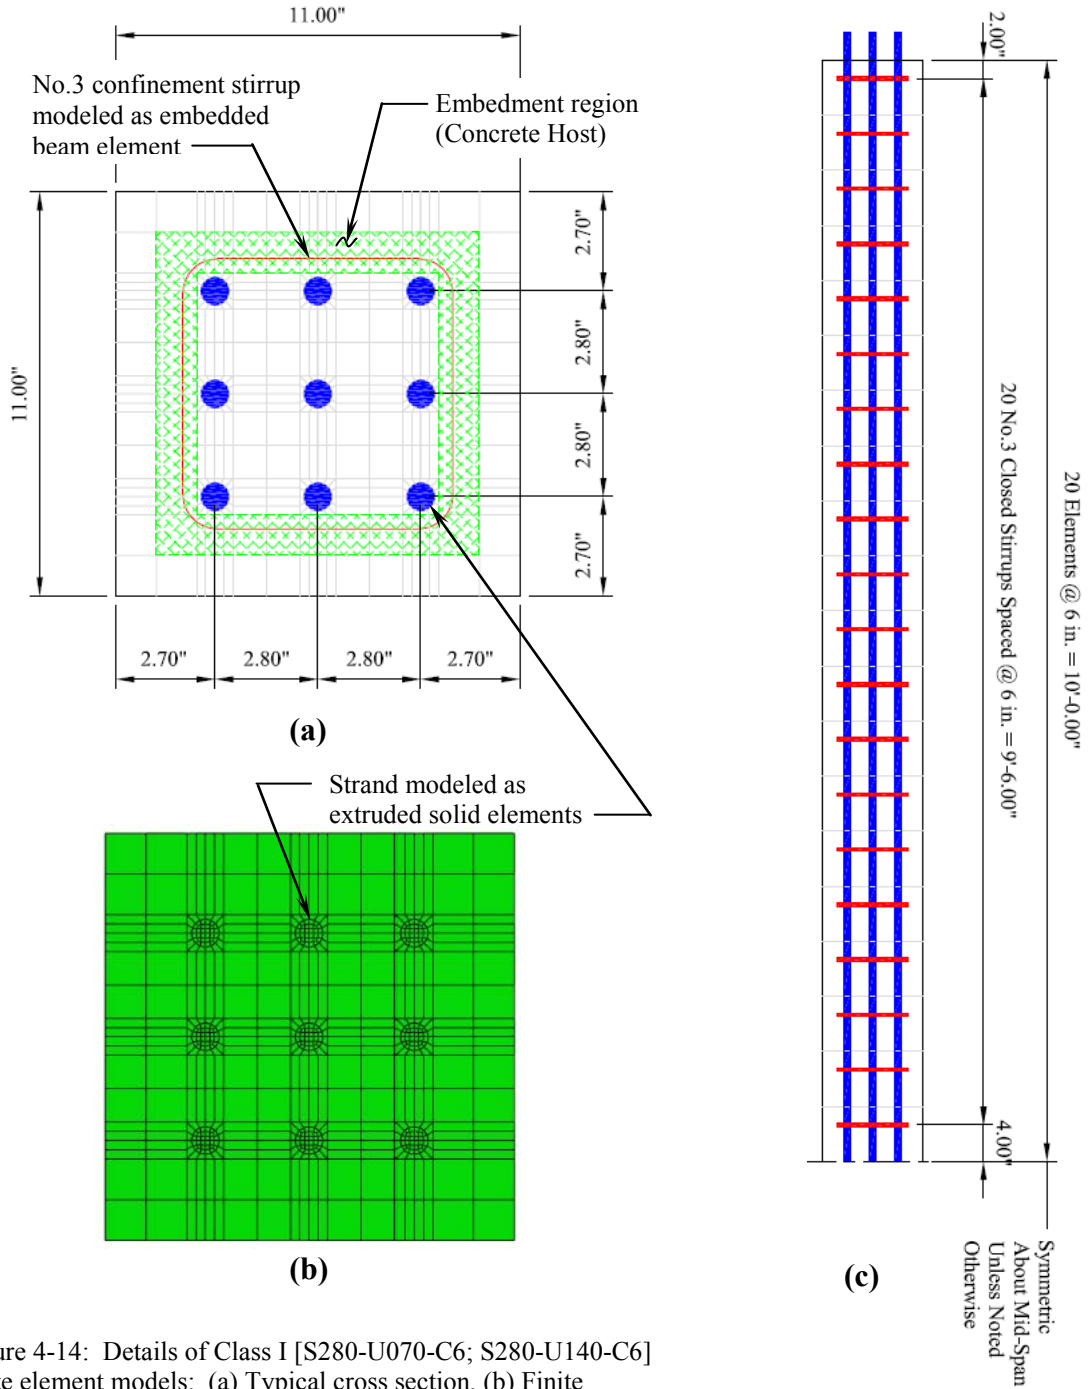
Details of Class I [S280-U070-C6; S280-U140-C6] finite element models: (a) Typical cross section, (b) Finite element simulation, and (c) Layout of confinement reinforcement (No.3 closed stirrups spaced at 6 in. on center)
